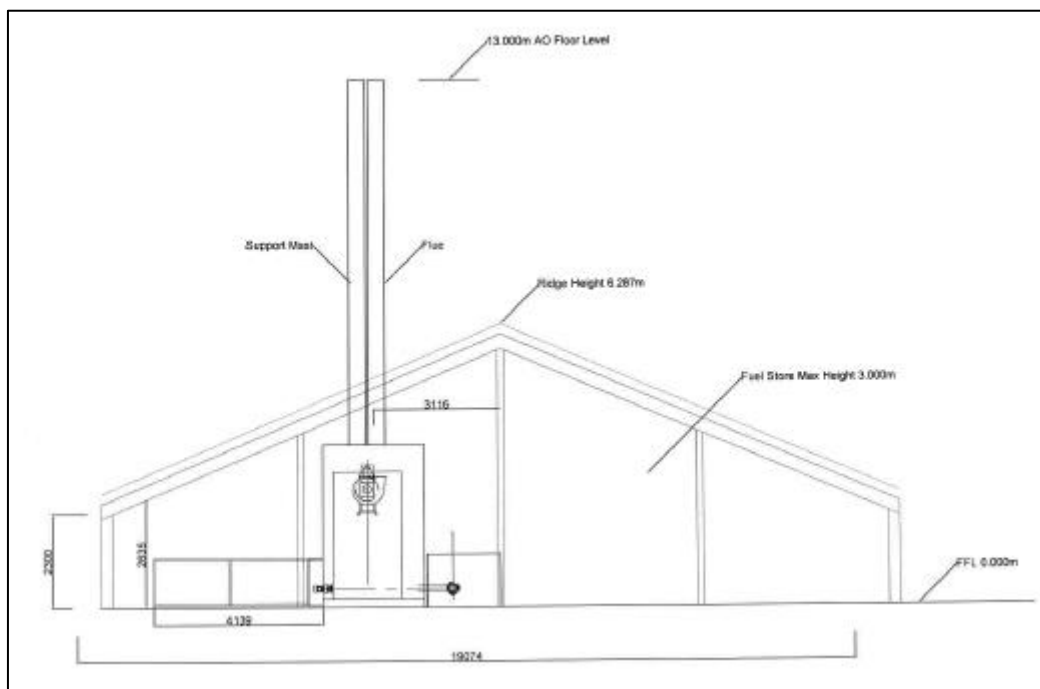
Site Elevation showing the Twinned Stacks of Boiler Installation.
